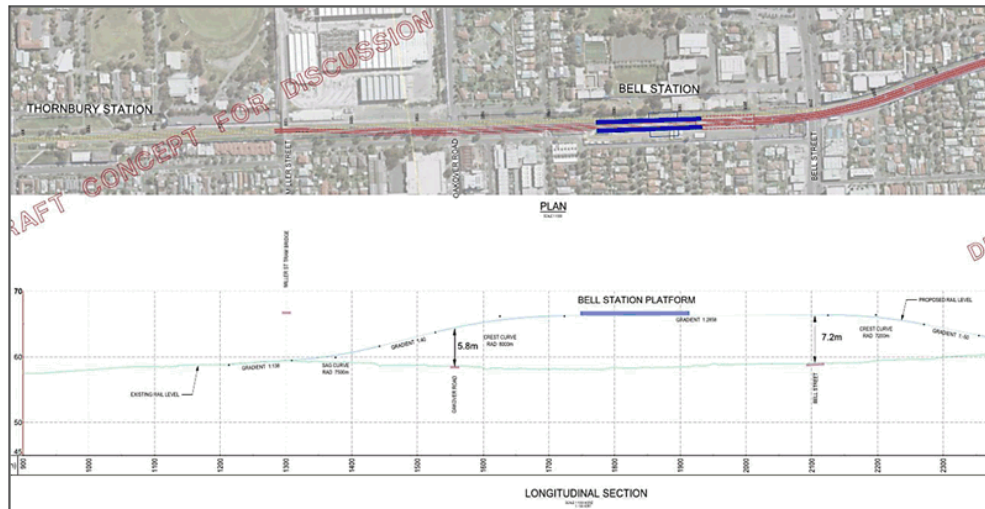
Example of the concept plan (*top*) and longitudinal section (*bottom*) of the Bell Street rail elevated – base case
